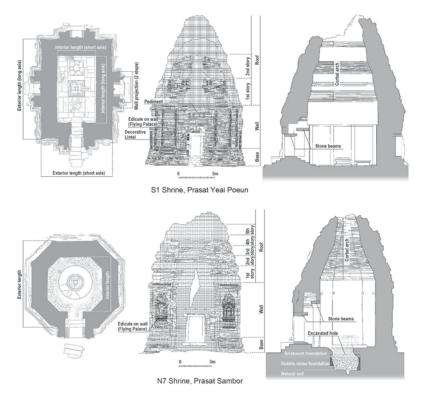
Plan, elevation, and section drawings of the representative brick structures in Sambor Prei Kuk (above) S1 shrine (high tier roof type structure) and (below) N7 shrine (low tier roof type structure).
